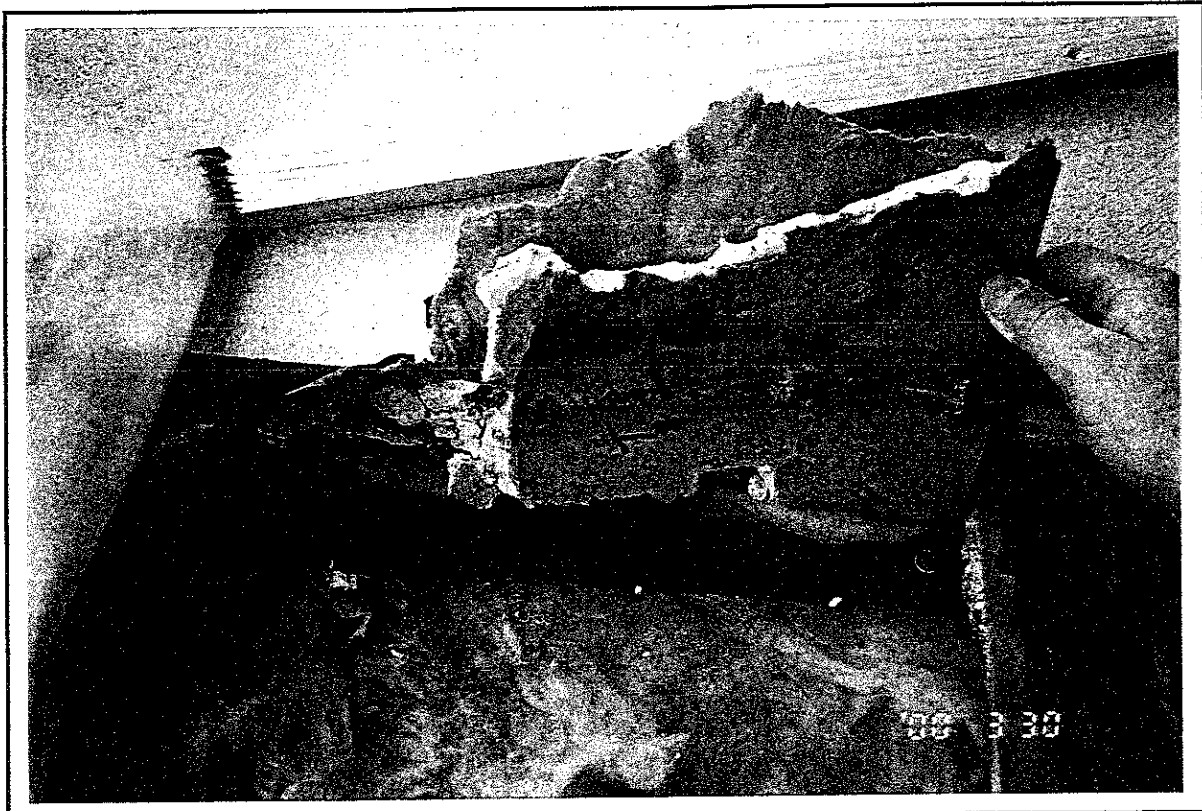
Test Area #2 – Mouldy gypsum sheathing & corroded steel studs
